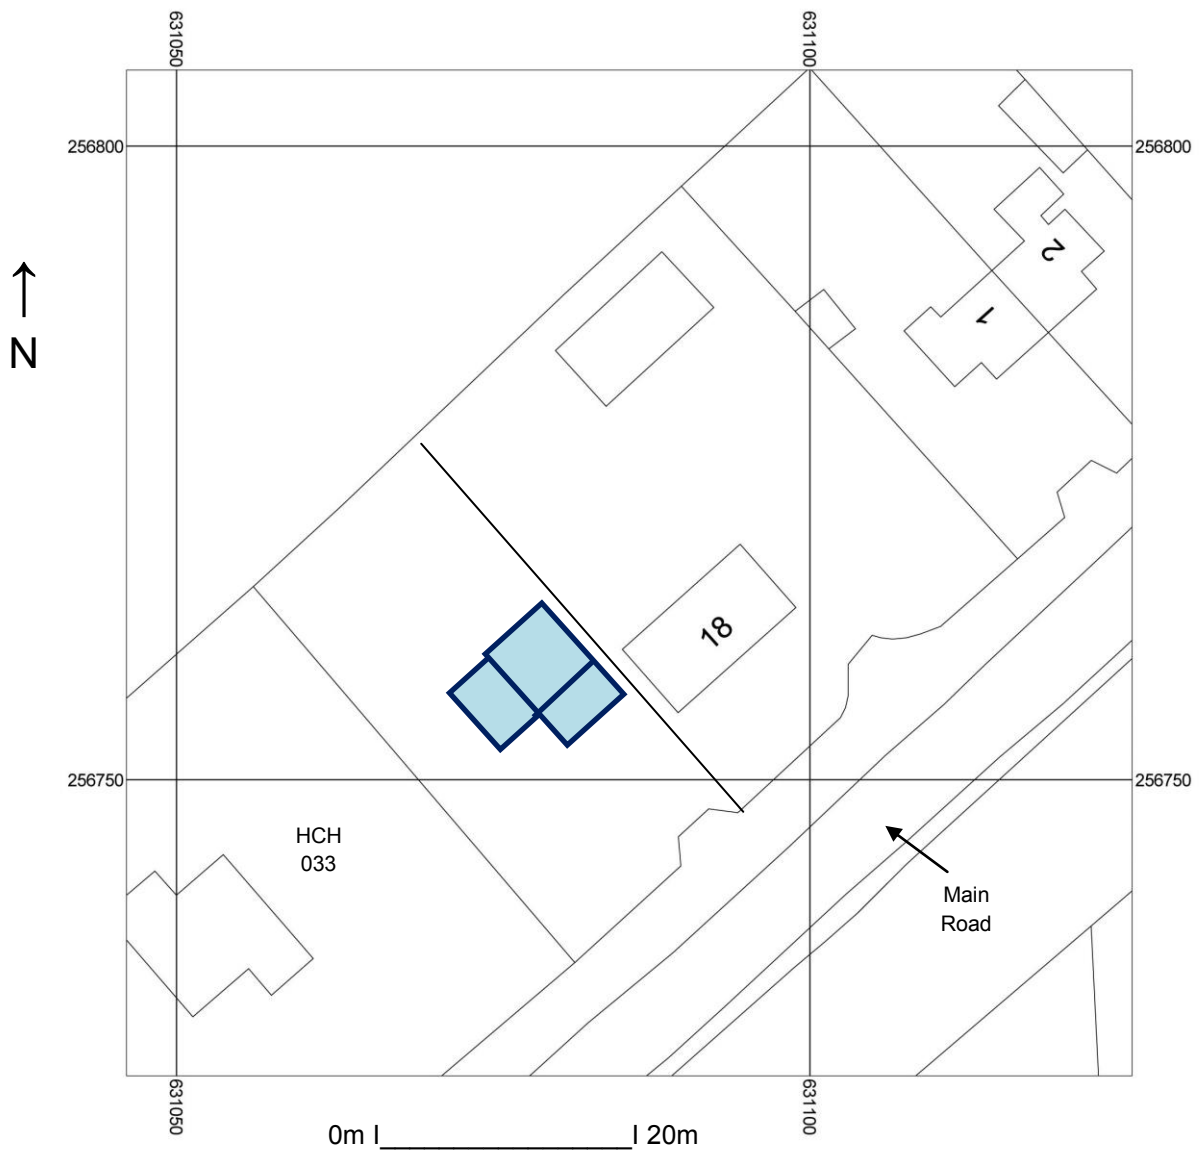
Site location (light blue- new footprint area, dark blue- trenches)
